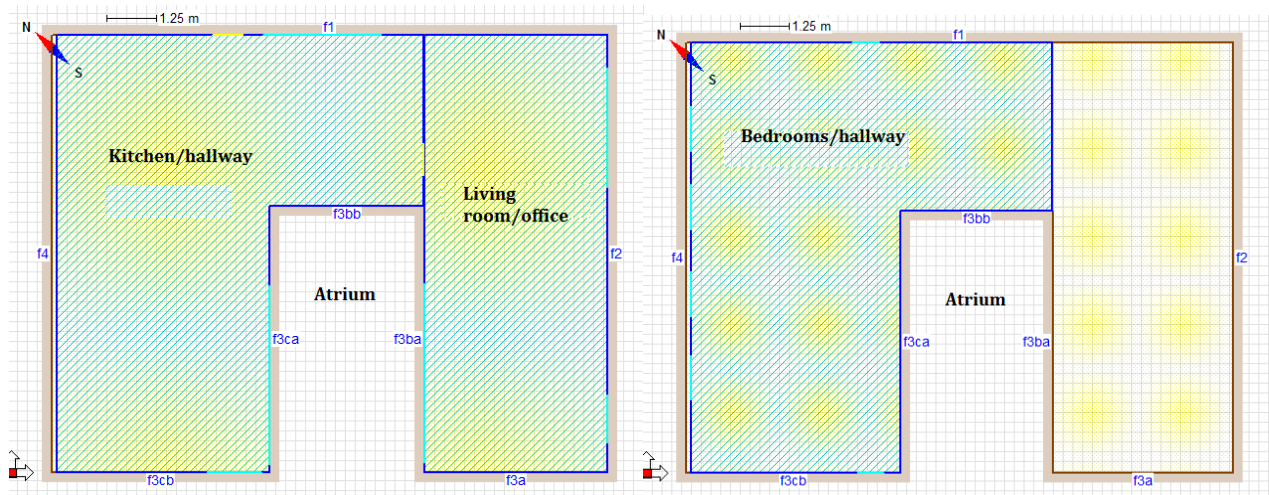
Ground and first floor in "Multikomfort" building model designed in IDA ICE
